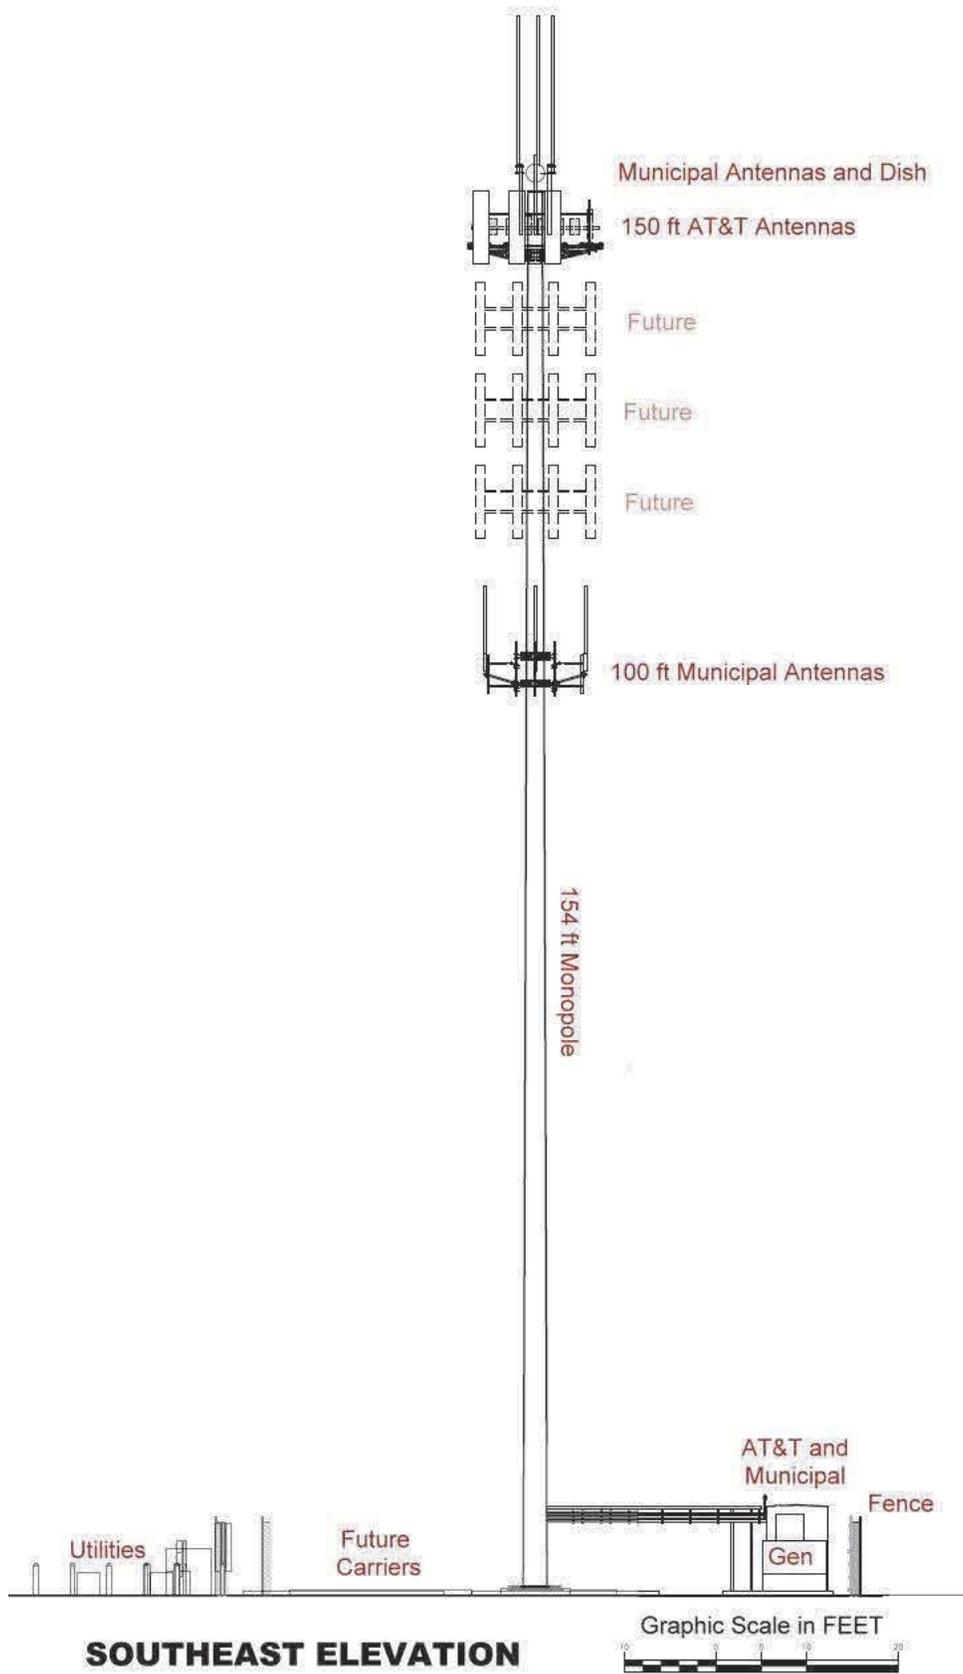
Plan Showing the Proposed Elevation Character of the Project
